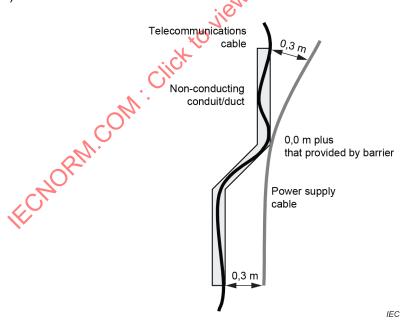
Example showing the protection of underground information technology cables when located next to power supply cables
